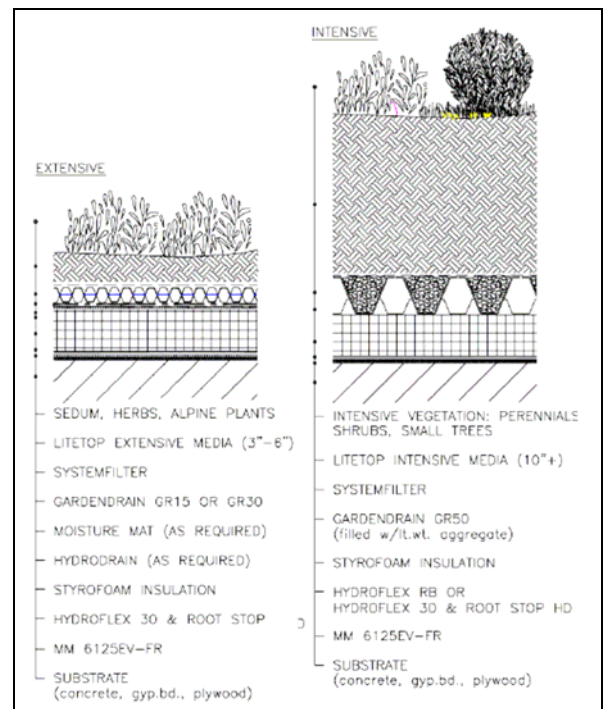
Hydrotech Typical Standard Intensive and Extensive Green Roof Assemblies (<http://www.hydrotechusa.com>, accessed 7/4/08)
